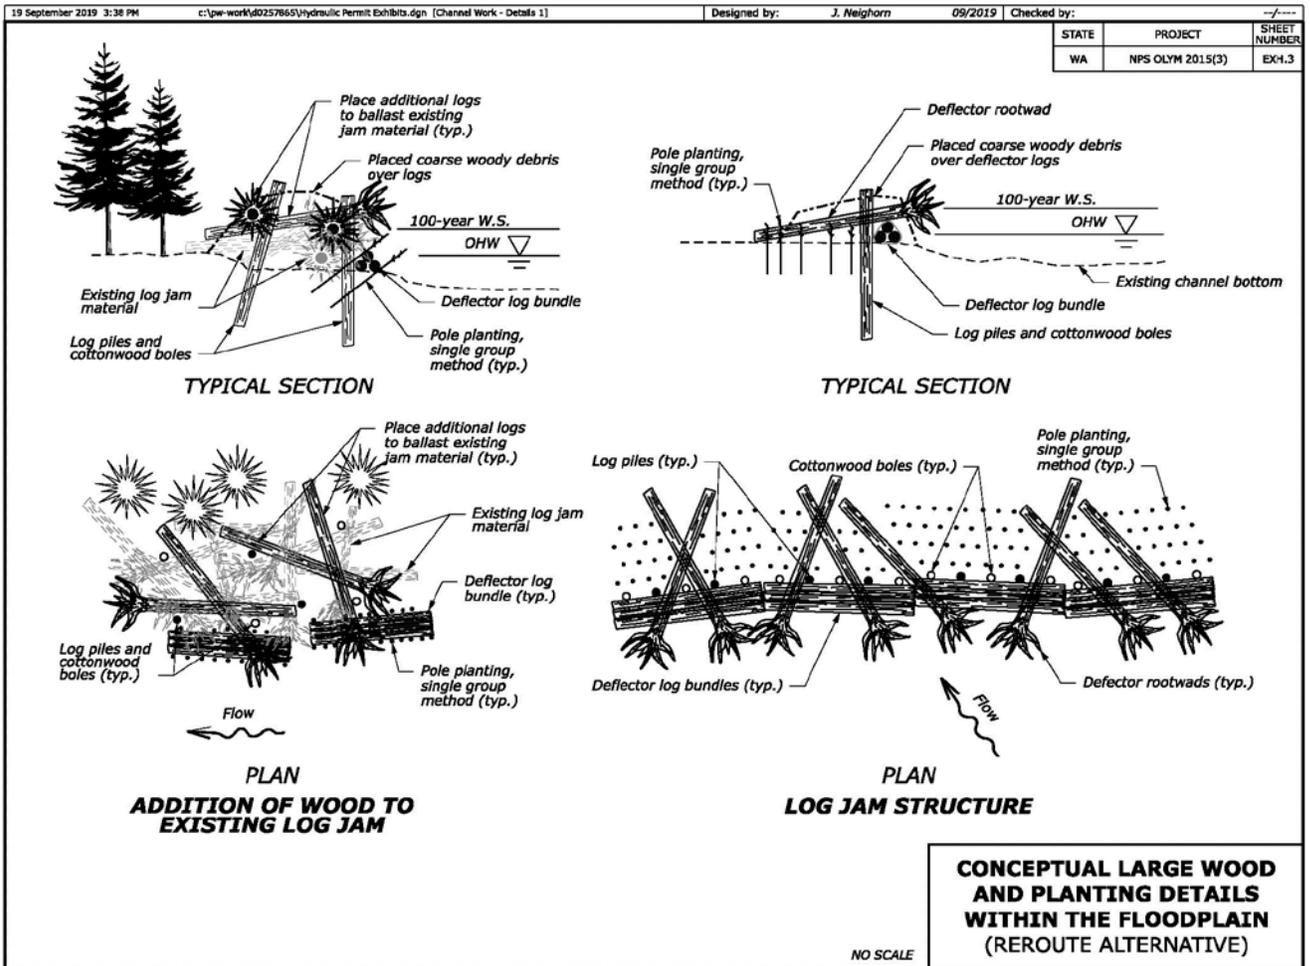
Reroute Conceptual Wood Structure and Planting Details
